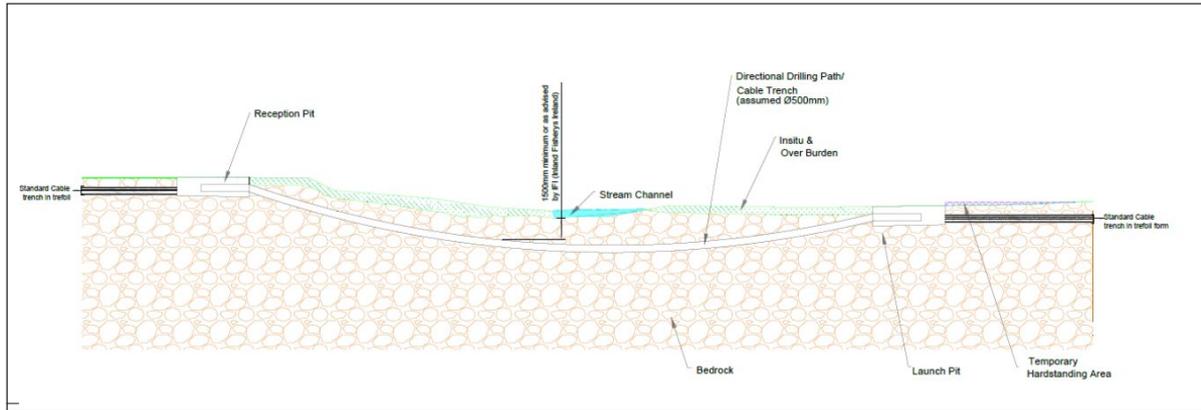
Typical Horizontal Directional Drill Water Crossing
